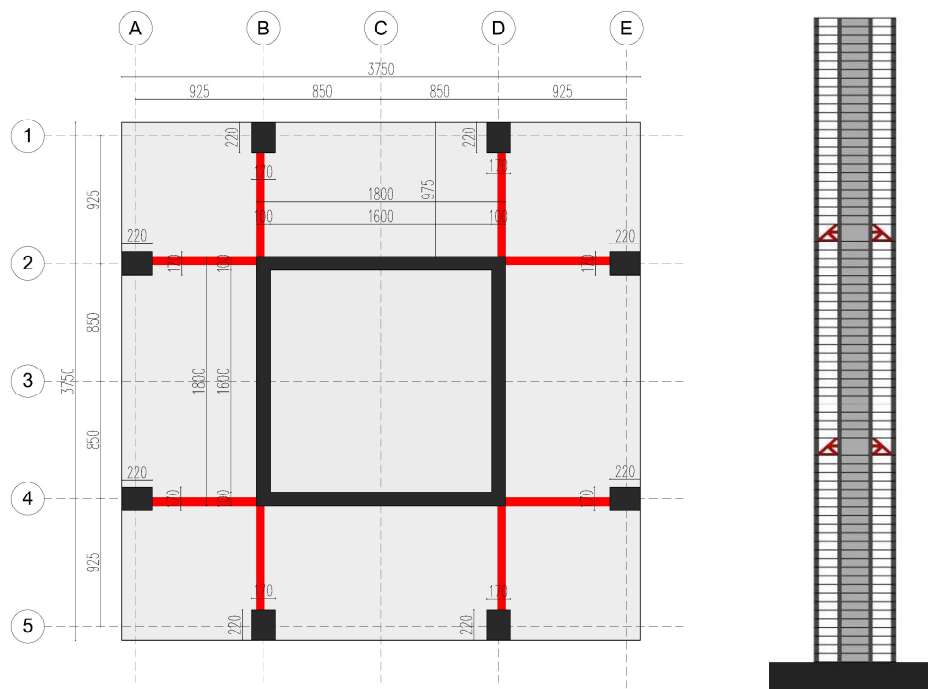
Typical floor plan (left) and elevation (right) of "primary core building" with outrigger frame system
